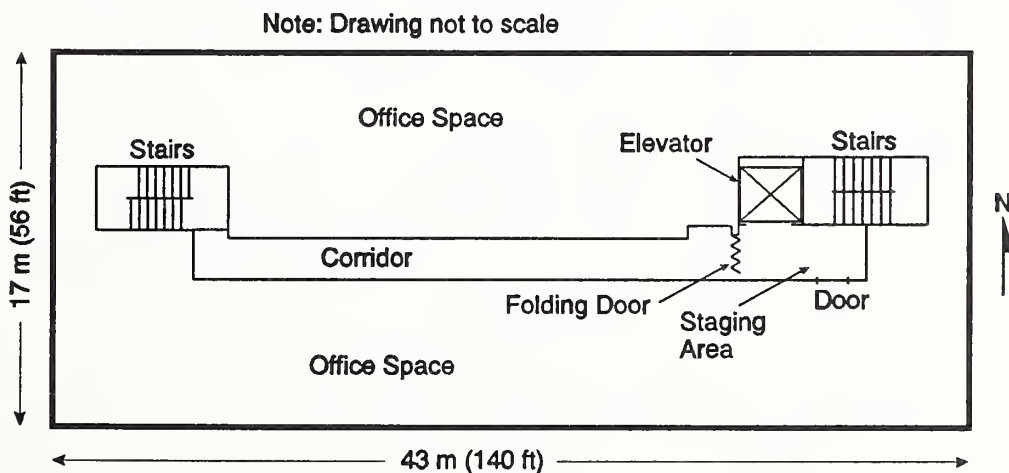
Typical plan of floors 2, 3 and 4 of the Bemidji Federal Office Building
